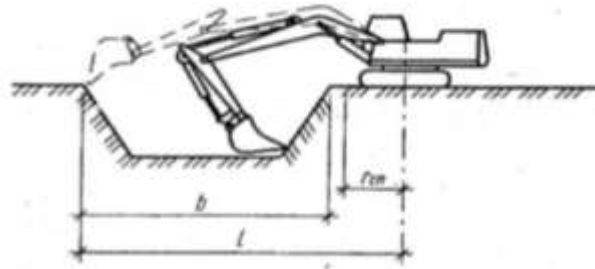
Scheme of the pit excavation for one foundation by excavator – backhoe from several datum levels
